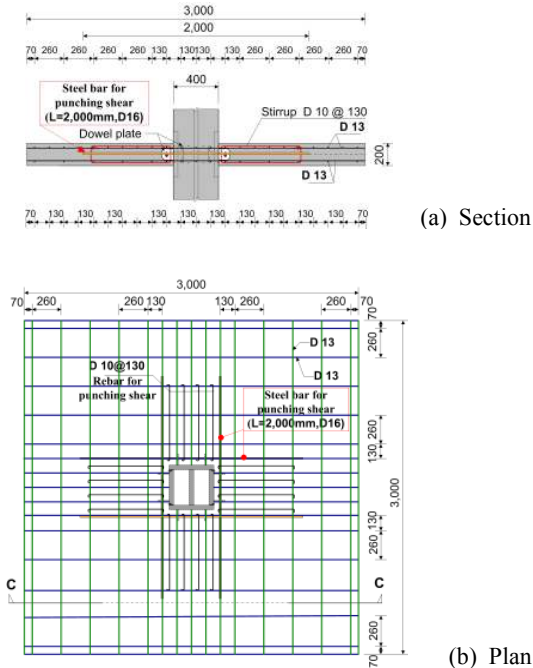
Reinforcement Details of Specimen (B\_S\_400\_DW16)
